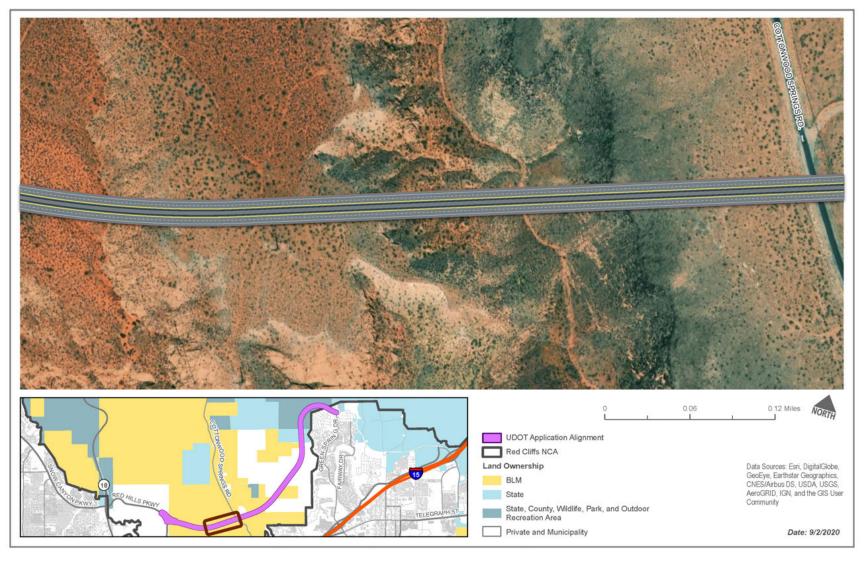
UDOT Application Alignment Plan View (3 of 9)
